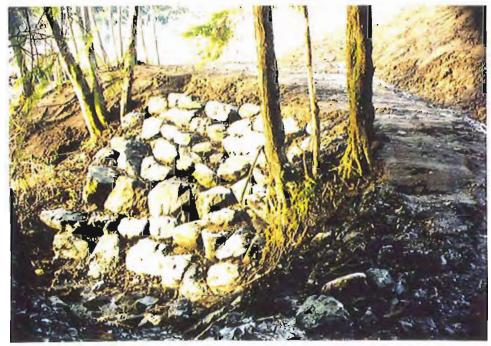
11/11/99 view of the completed stabilization rockwork along the bottom toe of the APC/Sitka landfill embankment at about Sta. 1+30'. Also shown is the completed 6"-thick layer of soil over the upper pathway and along the lower embankment to the left side of the rockwork.
